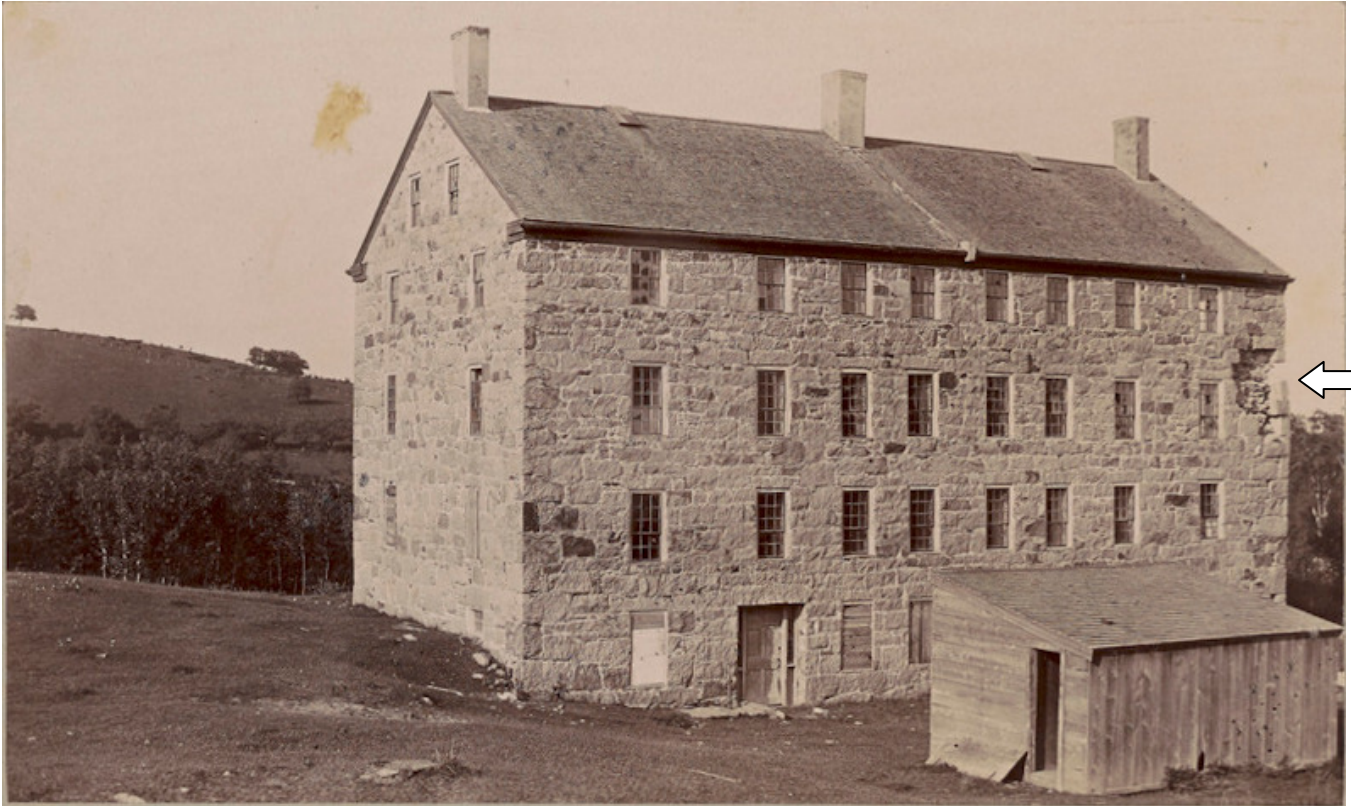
Historic photograph (circa 1884-1896) of stone boarding house. The boarding house was built on a gently sloping plateau partway up the hillside. The basement level has a series of full size windows across the front which are boarded up in this photo. The basement level door has narrow doorframe windows on either side (like a house entrance doorway) suggesting this a finished living level to the building rather than basement storage. Above the basement level is three full stories and a gabled attic. Measurements from the photo suggest it was about 30 x 45 feet in size.¹¹ Some damage to the masonry is evidence on the right side (arrow). The wooden building in the foreground was likely the outhouse.
